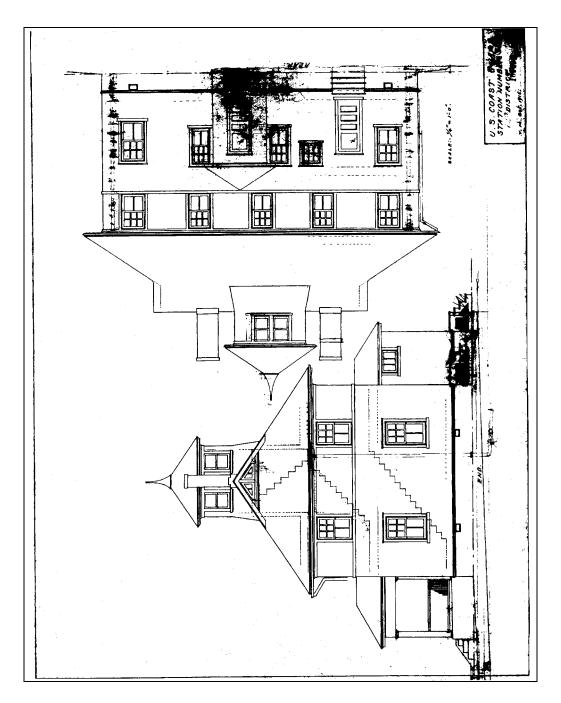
Siuslaw River Lifeboat Station, Side and Rear Elevation Drawings, October 1916. Source: U.S. Coast Guard Civil Engineering Unit, Oakland, CA.
